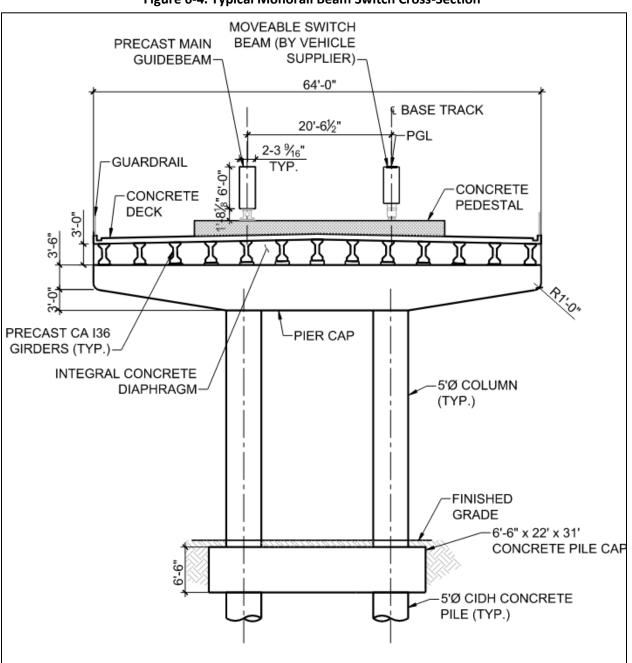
Typical Monorail Beam Switch Cross-Section
